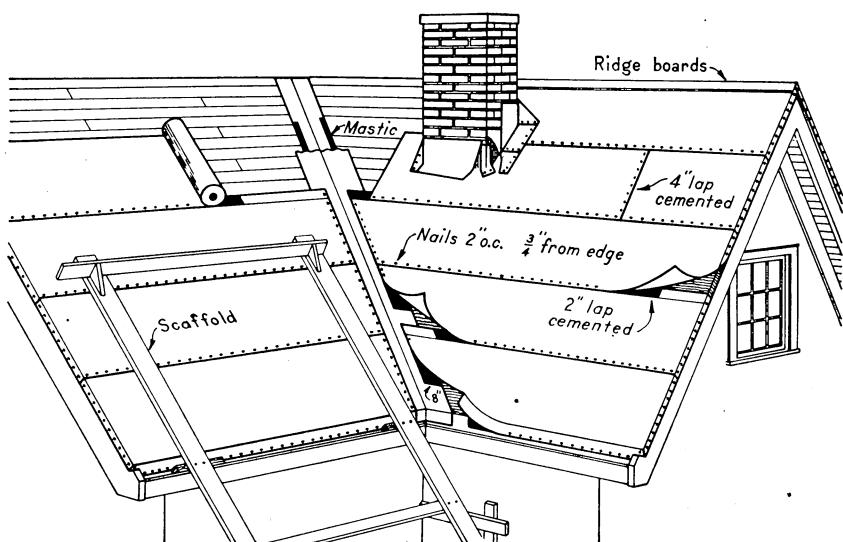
Roll roofing laid parallel to the eaves; scaffolds should be provided as a safety measure for workmen.
